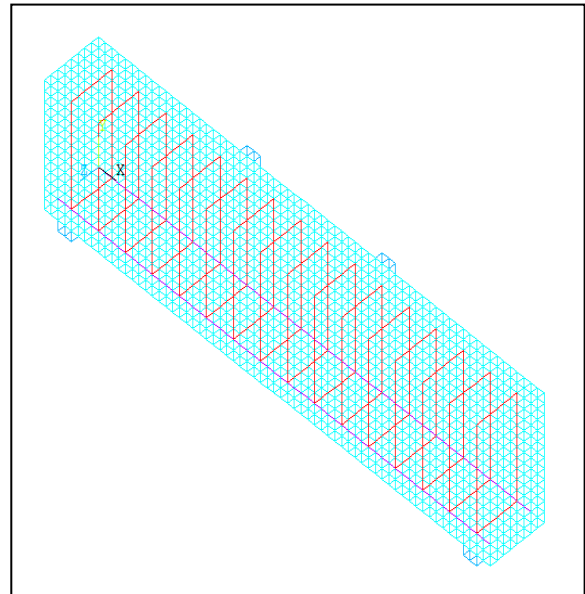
Three dimensional wire frame view show the full layout reinforcements of simulated reinforced concrete beam.
